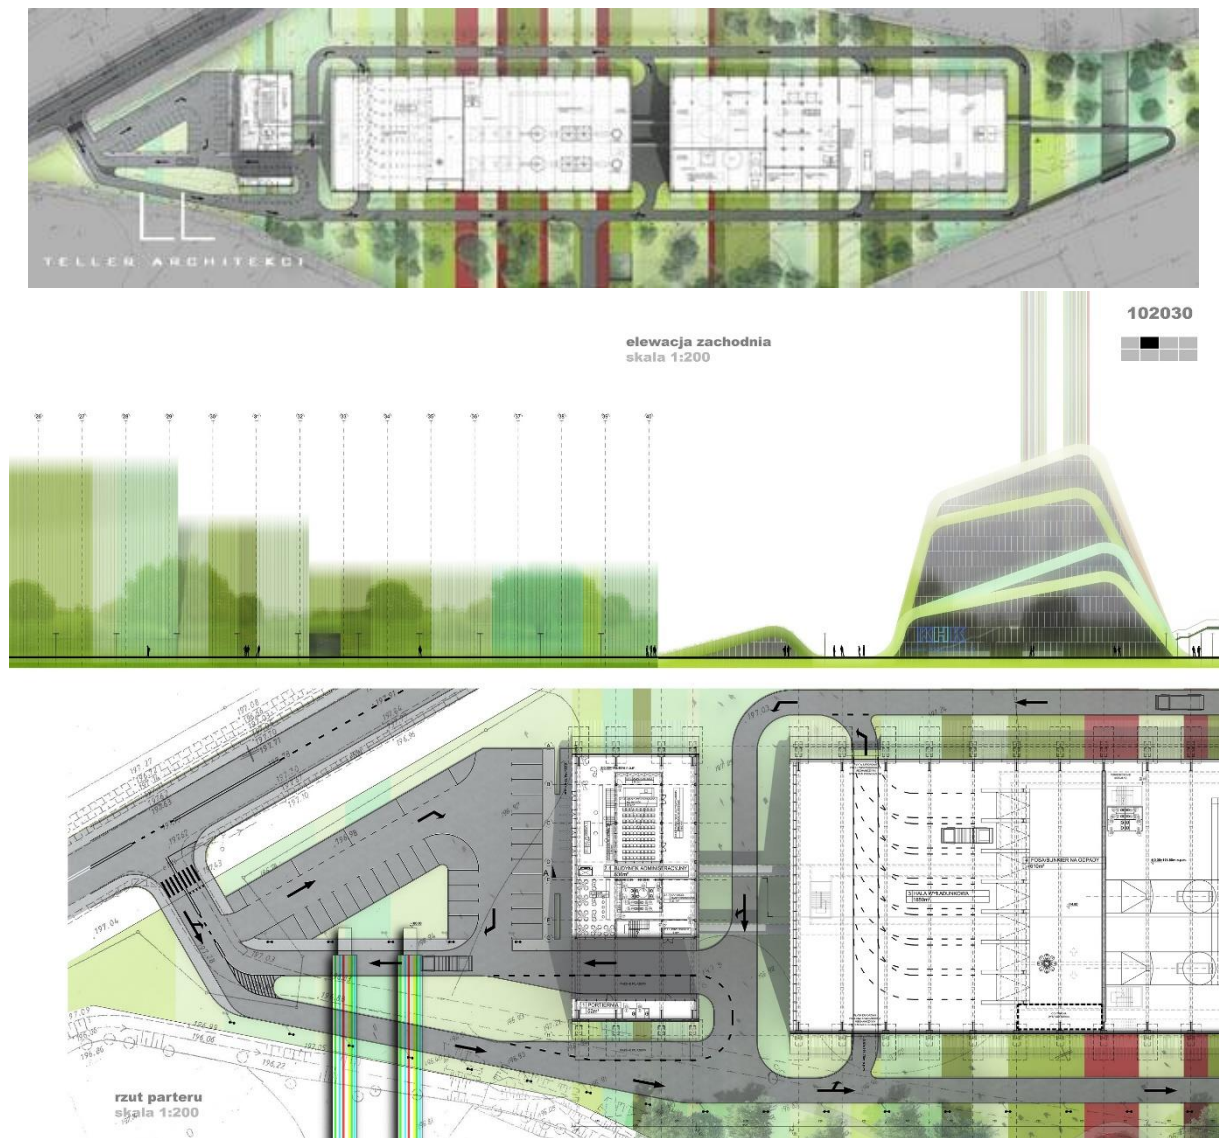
Waste incineration plant in Krakow – plan and elevation.
